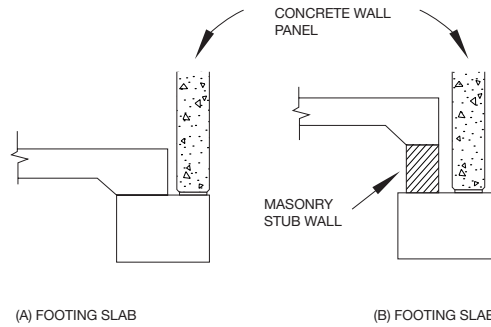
Examples of Footing Systems Requiring Joint Treatment
